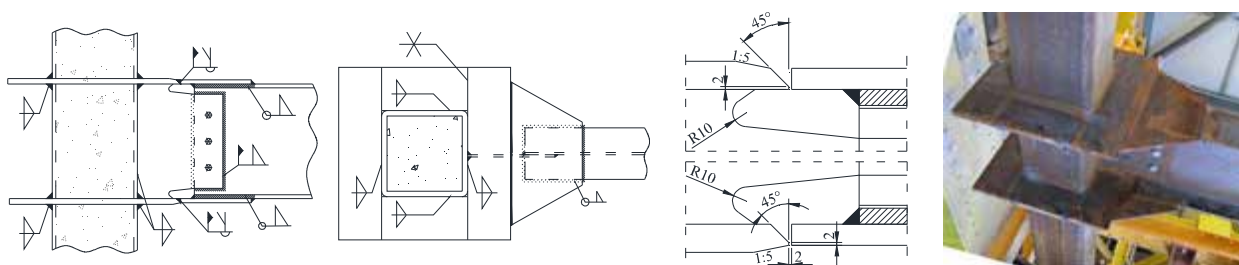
Welded beam-to-column joint with cover plates: joint configuration and preparation details for full penetration welds between external diaphragm and cover plates (top & bottom)
